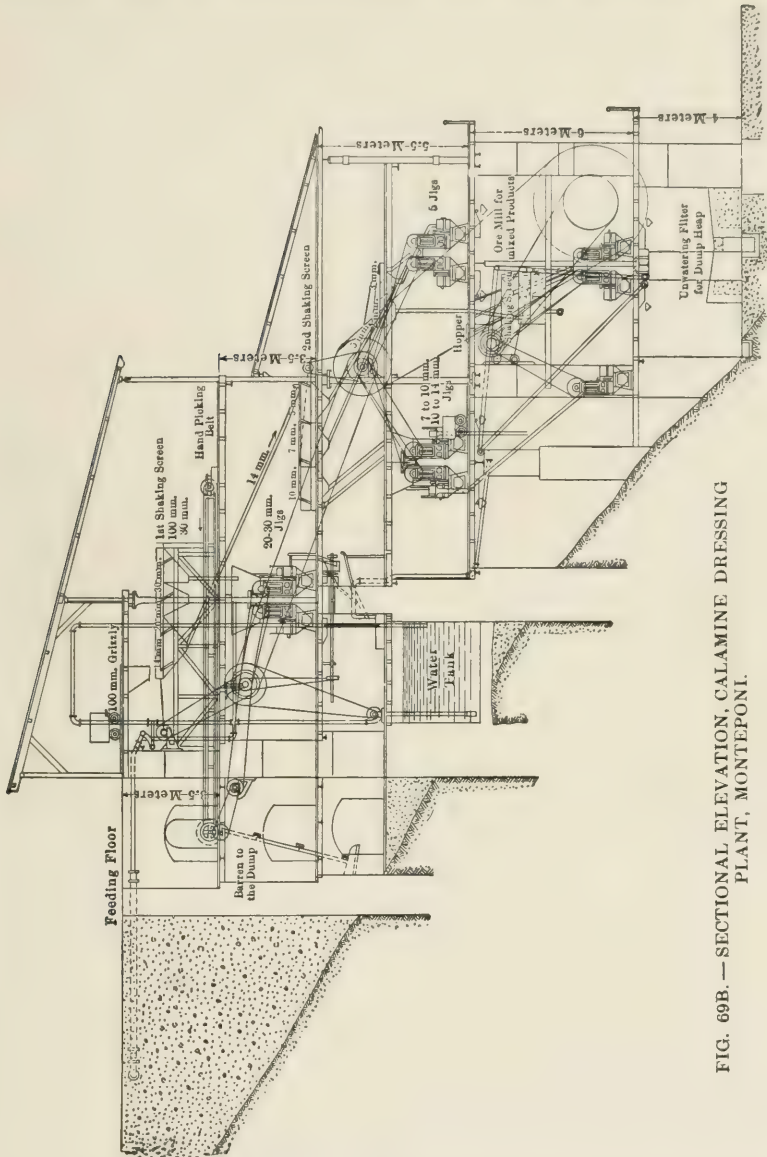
B. — SECTIONAL ELEVATION, CALAMINE DRESSING PLANT, MONTEPONTI.
